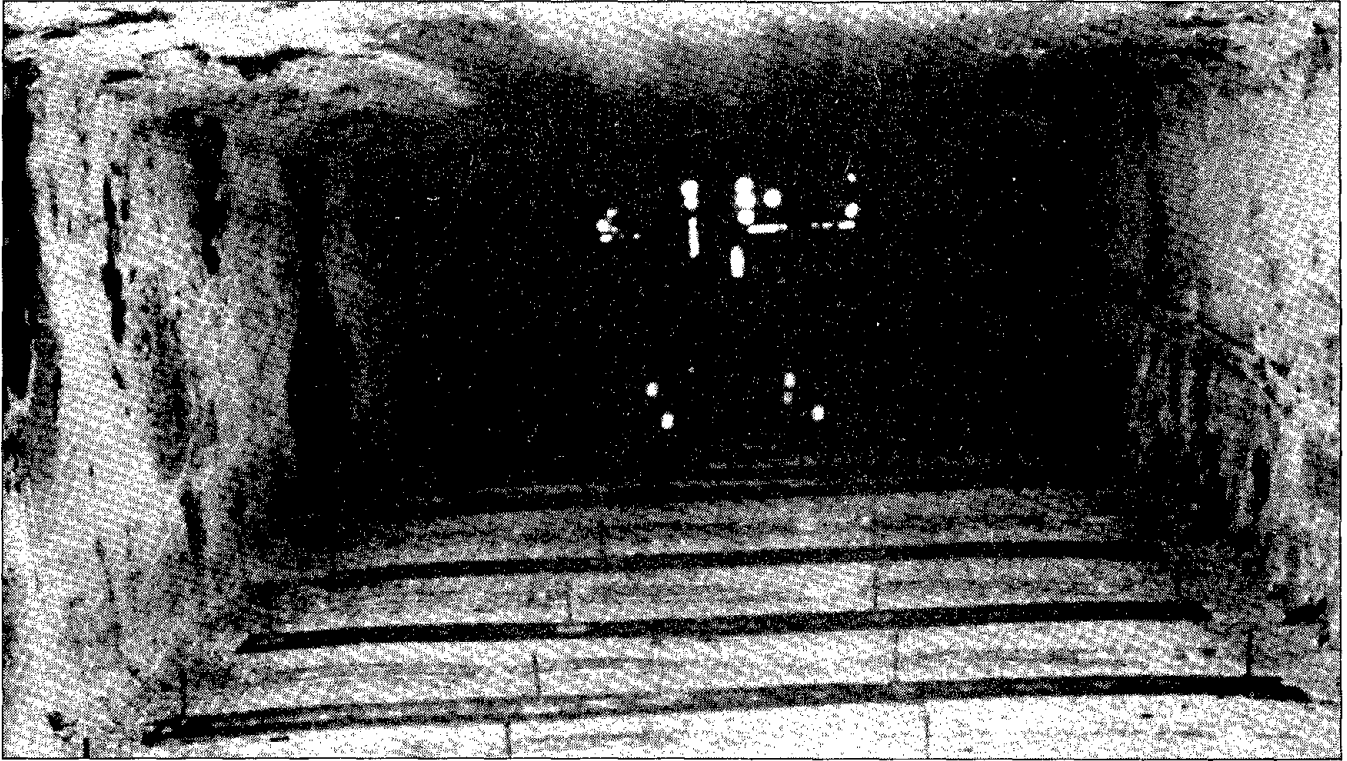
Resin-grouted cable test area immediately after cable support installation (before first panel mining).
